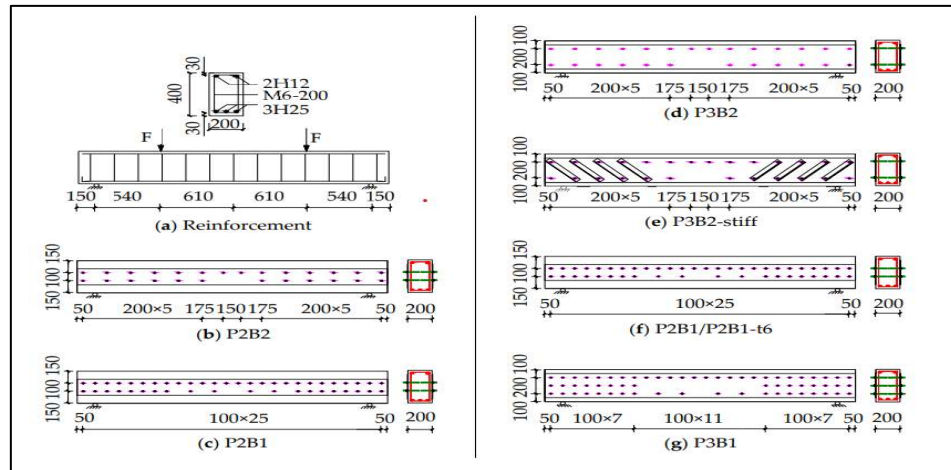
Jacketing reinforced beam with steel sheets [21]
